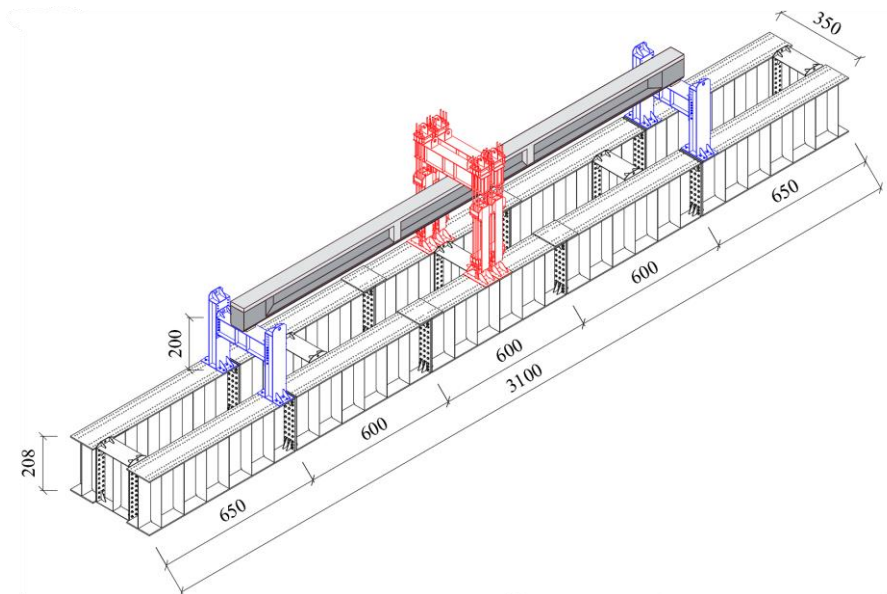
Technical drawing of the load frame: steel frame base (black), supporting frames (blue), and loading system (red) (unit: cm).
